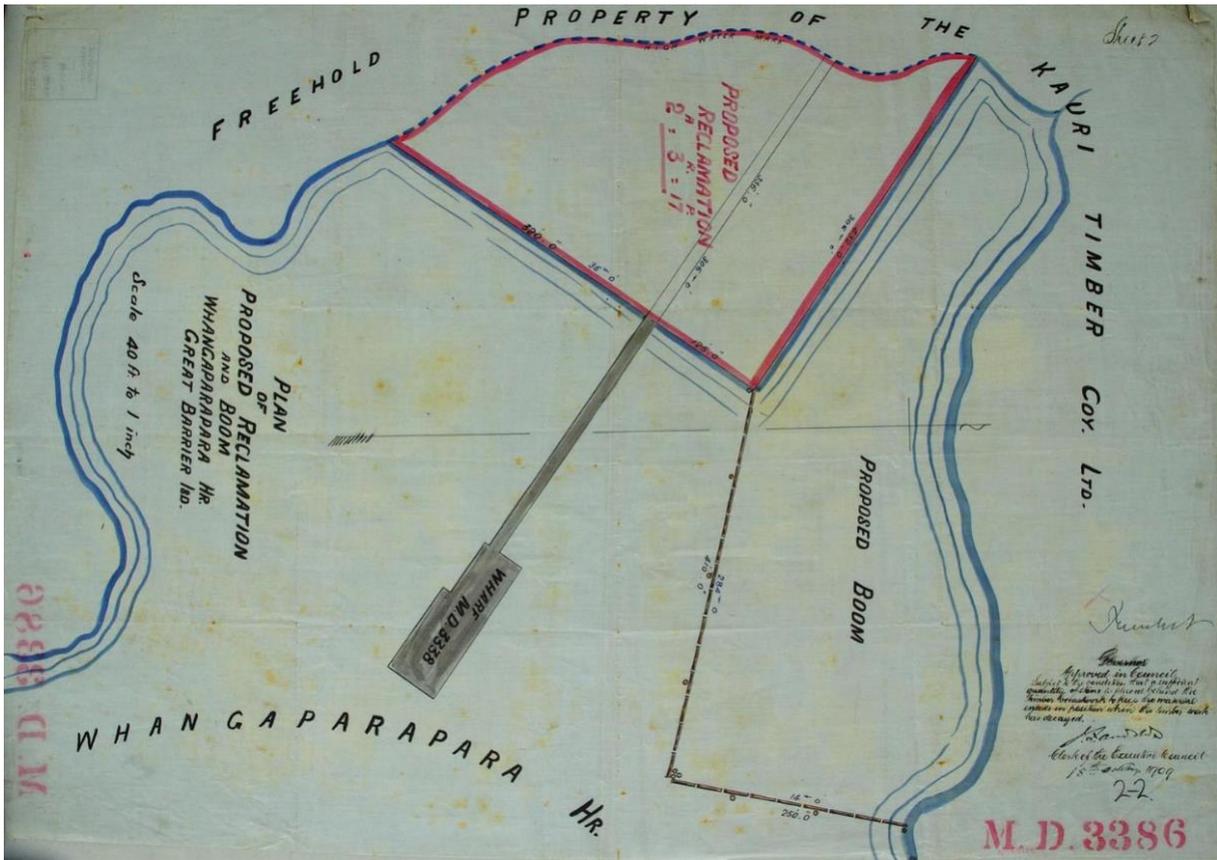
Marine Department plan MD3386(1909) showing the location of the wharf and proposed reclamation and timber boom.
